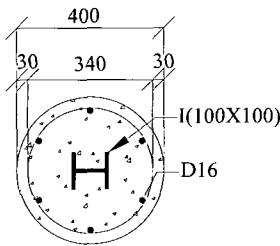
Section (unit:mm) Fig. 5 Test setup
